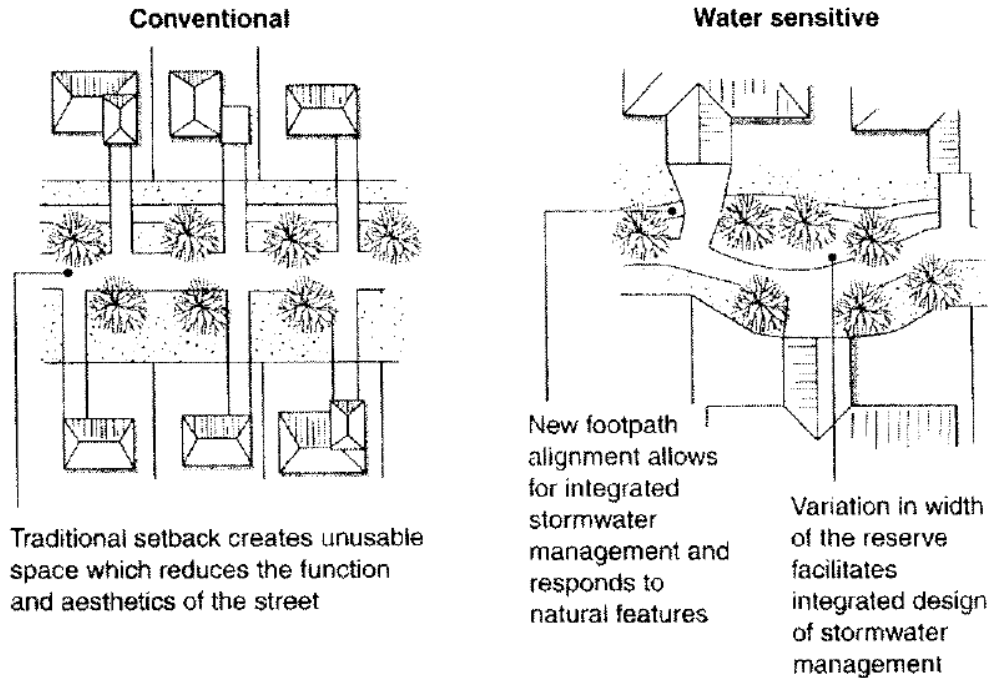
Conventional and WSUD road layouts (Source: Engineers Australia 2006)
